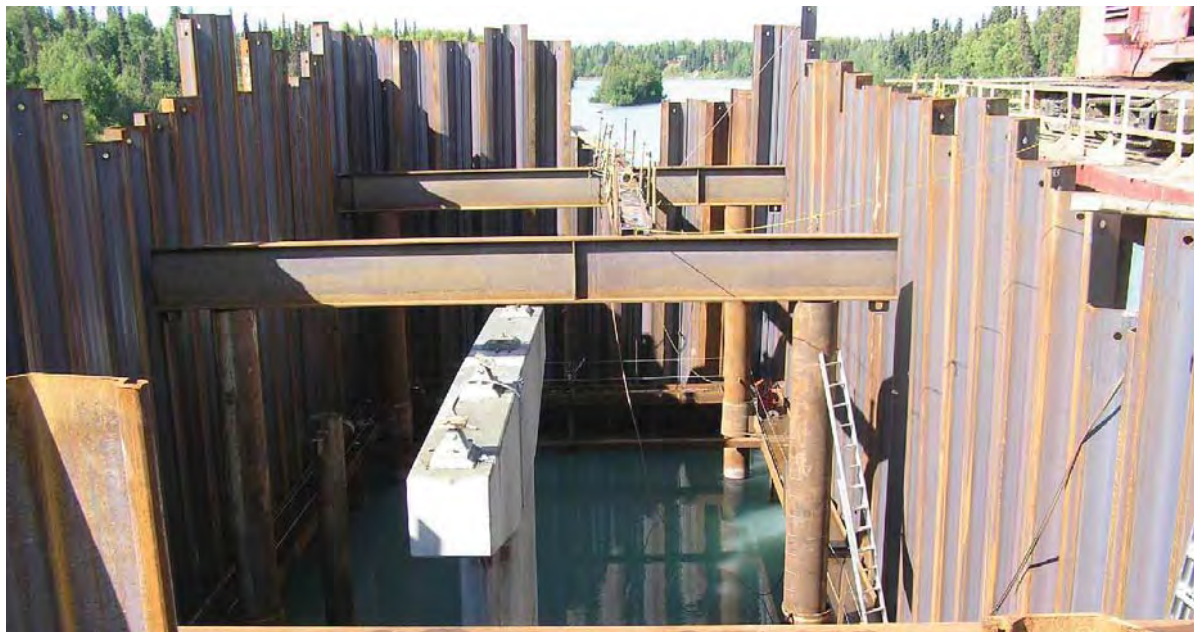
Cofferdam around existing pier (Soldotna, AK)
